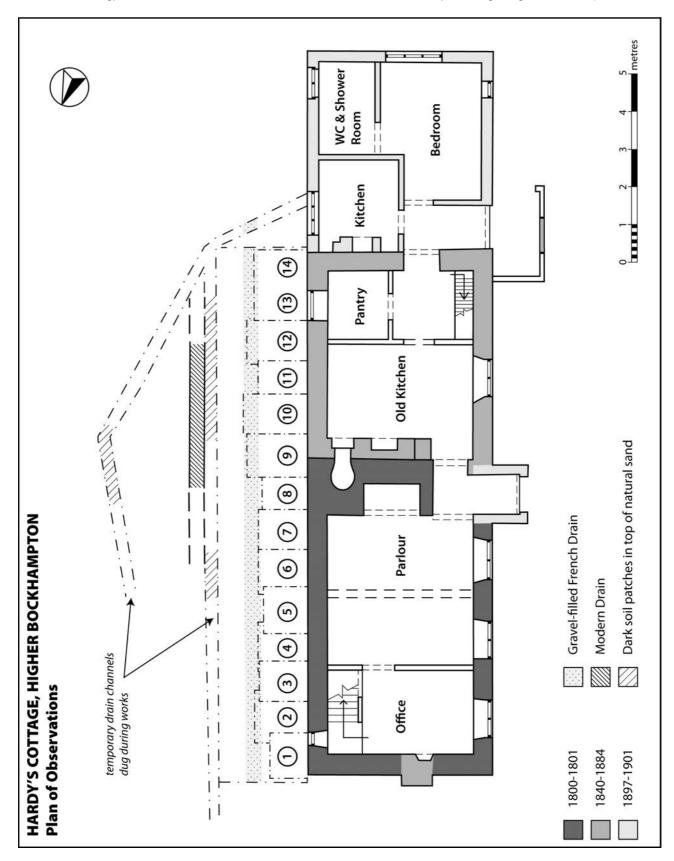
Plan of observations and simplified phase plan of Hardy's Cottage.
